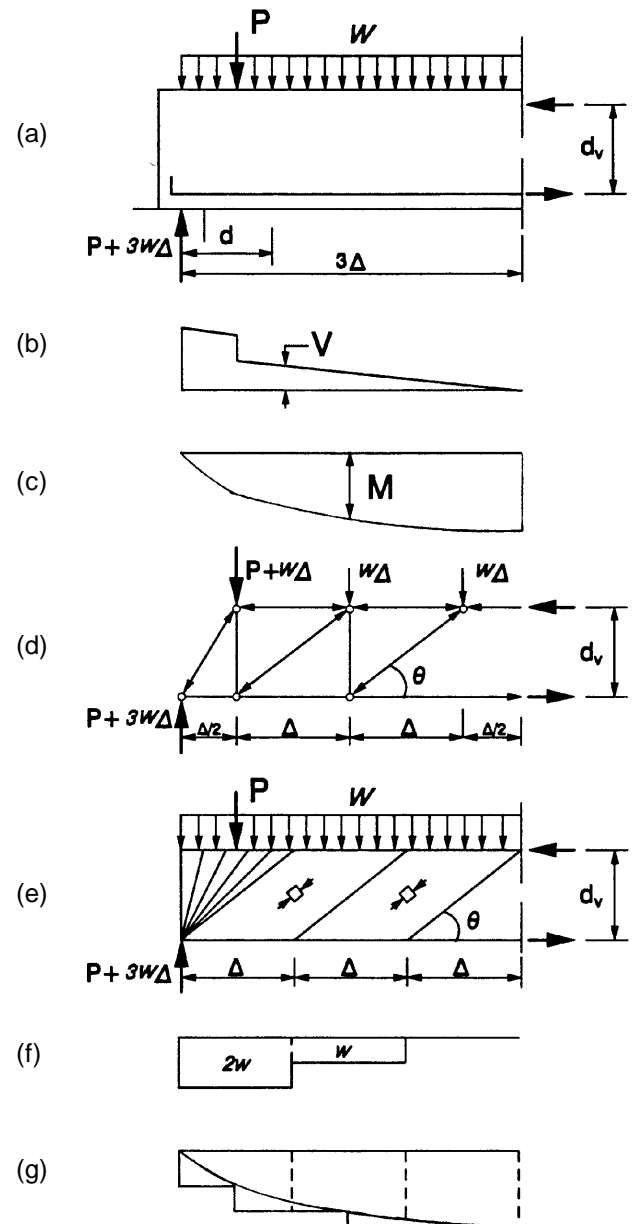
Truss model for simply supported beam with concentrated load close to support: (a) geometry and loading; (b) sectional shear forces; (c) sectional bending moments; (d) truss model; (e) discontinuous stress field; (f) required stirrup resistance per unit length of beam; (g) required longitudinal reinforcement (adapted from Marti³)
